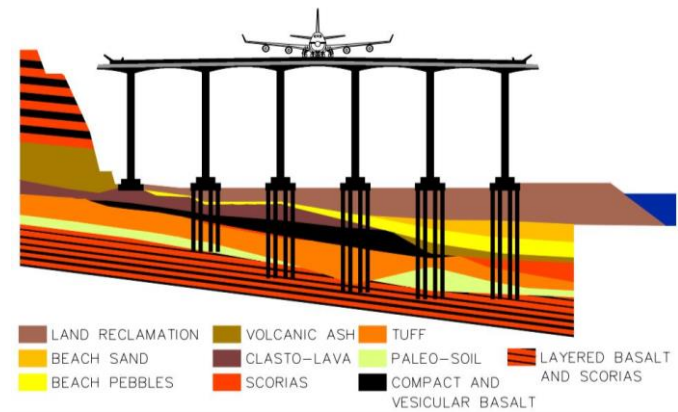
Typical Cross-Section Cut of the Runway Structure [6]
